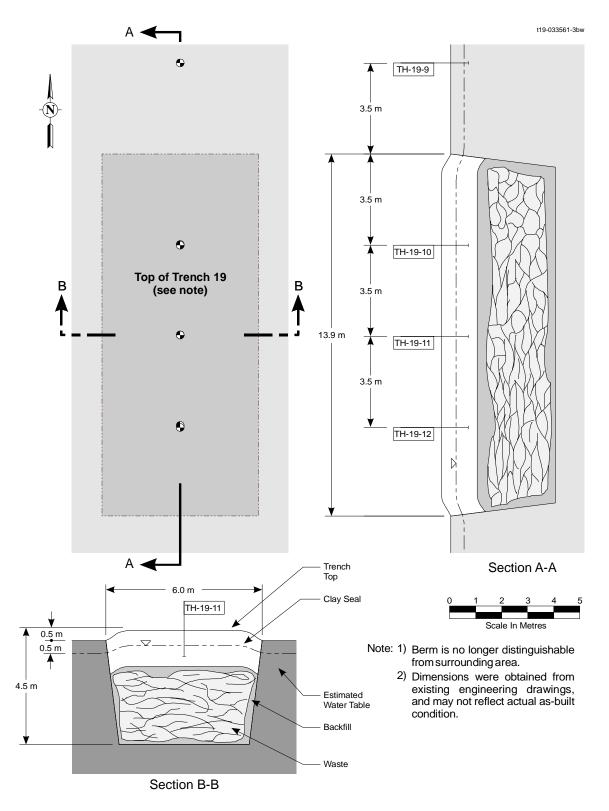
Plan and Section Views of the Waste Management Area Low-Level Waste Trench #19
